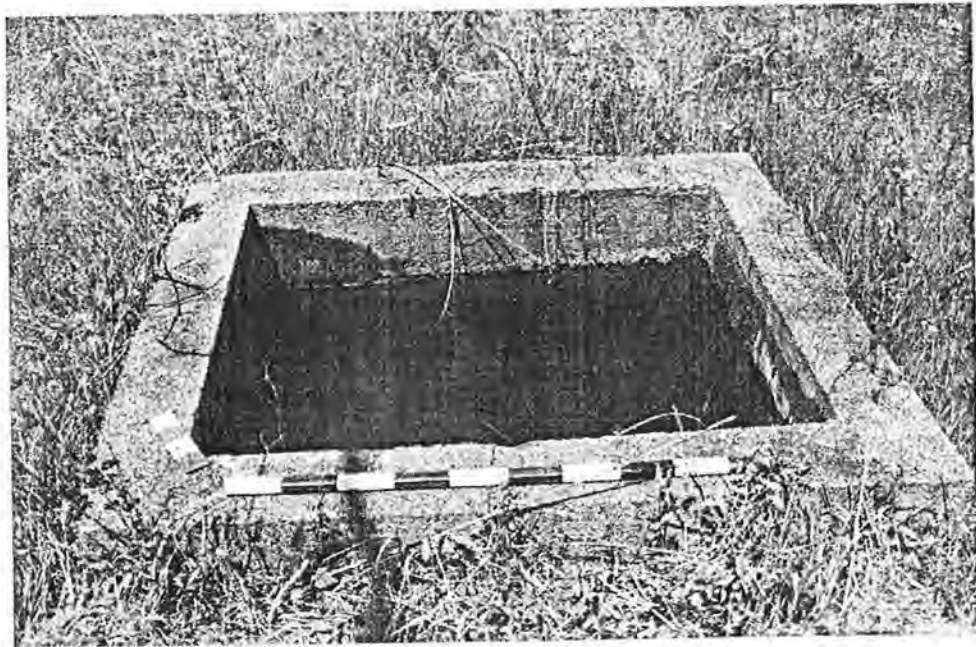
(33 Pk 217 (Stockdale Road Dairy). Concrete well box, facing north-northeast.
